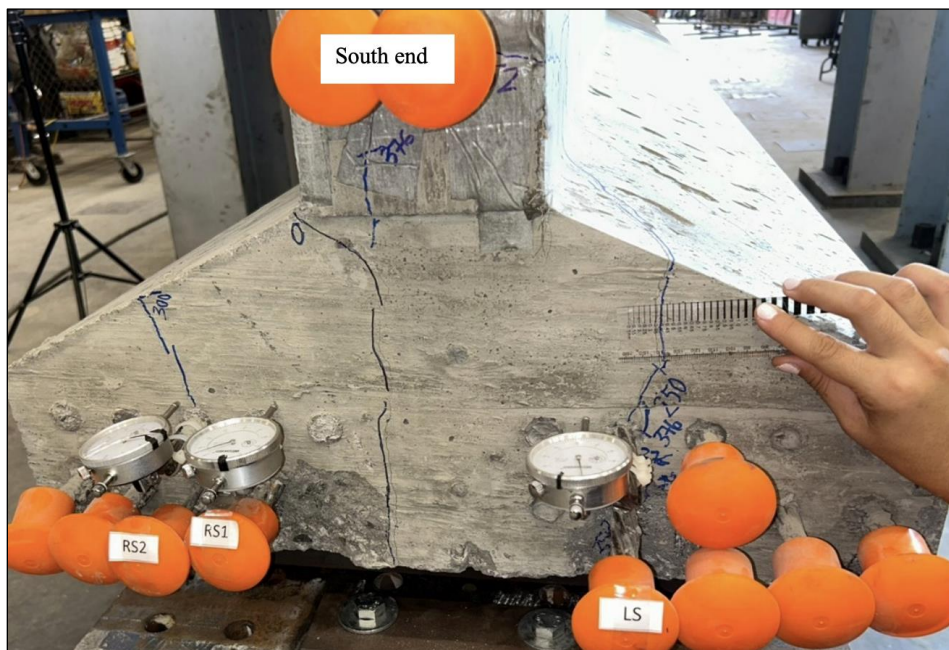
Photo. Test 3.2.S (repair 3.2RBF) south end cross-section crack adjacent to strand LS at 400 kip.
